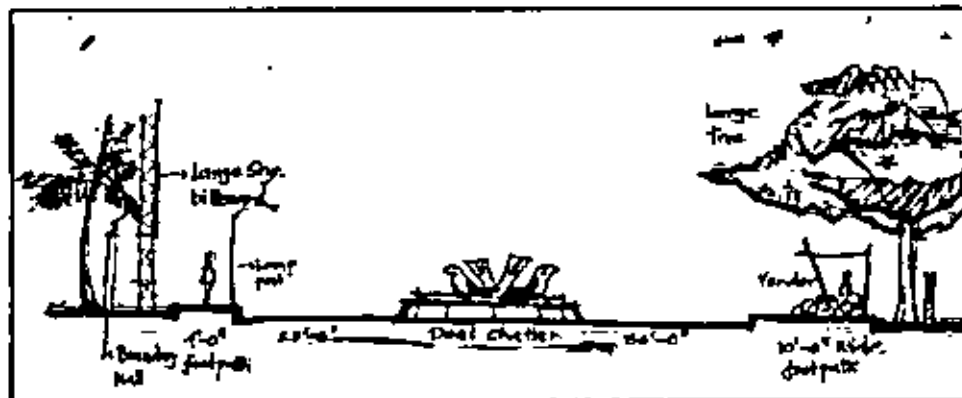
Sectional Elevation near Doel Chatter (Doel Roundabout).
